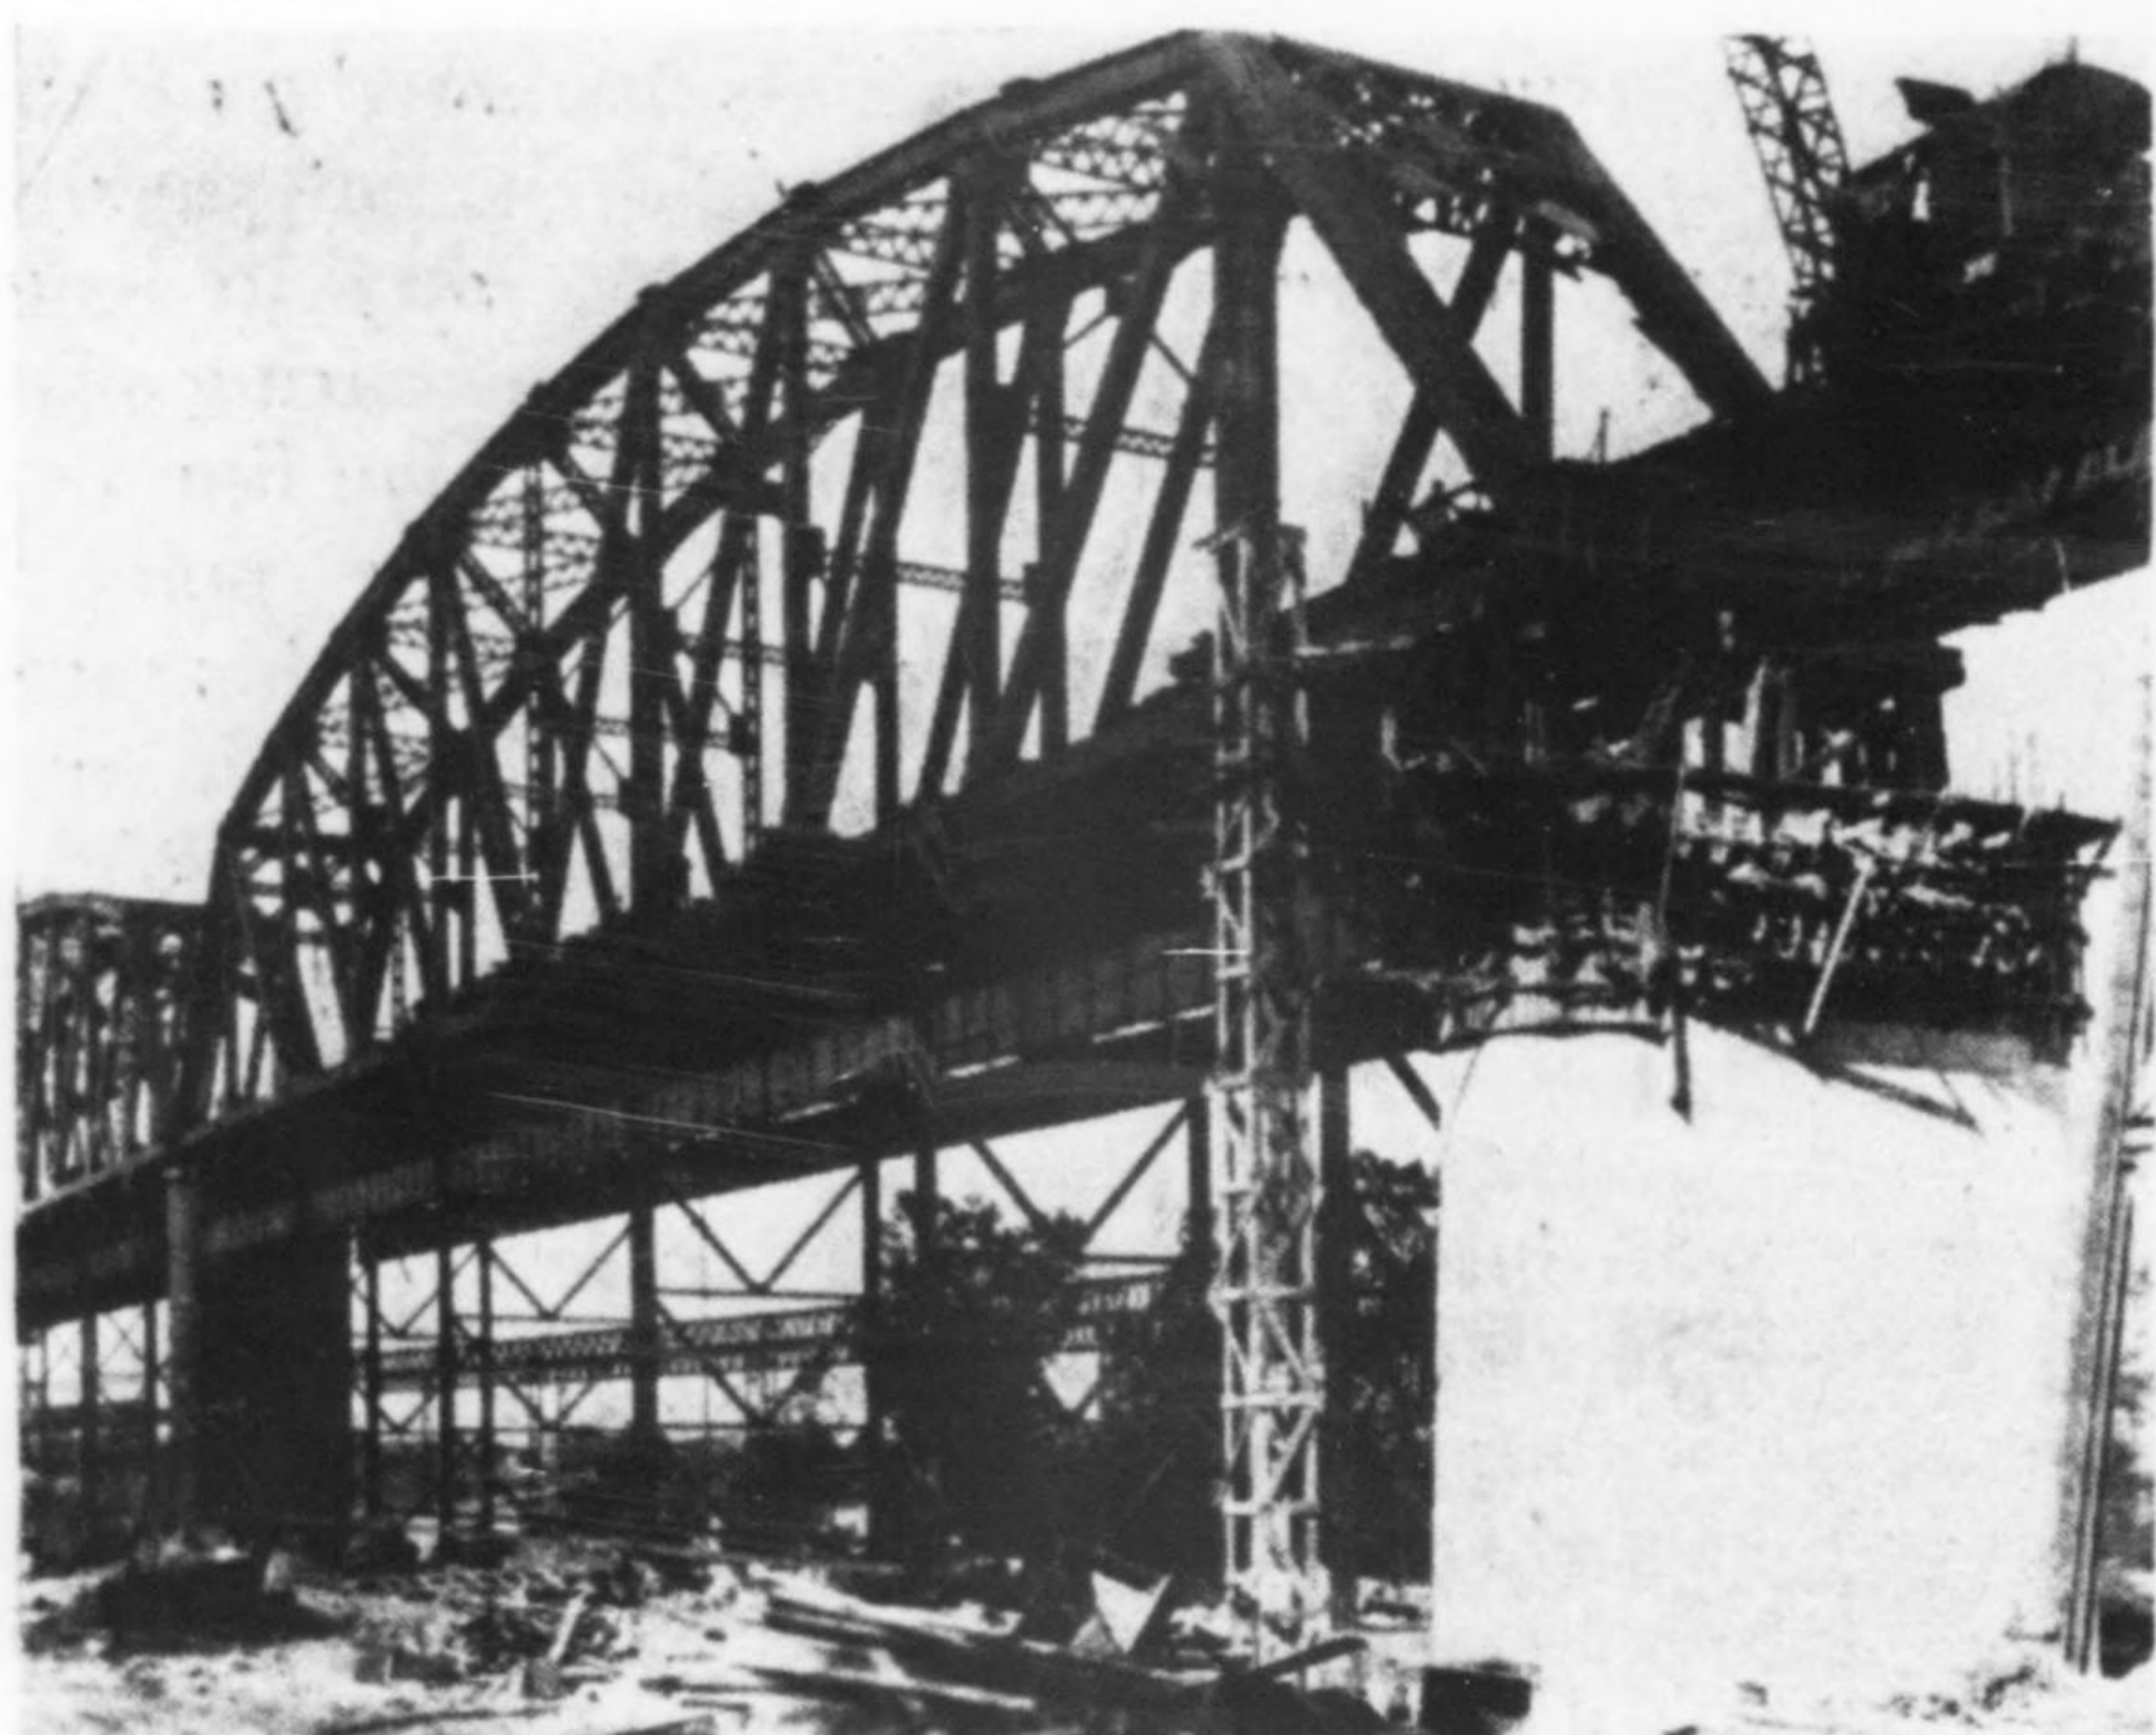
CONSTRUCTING THE TWO 338-FT. SIDE SPANS ON FALSEWORK
